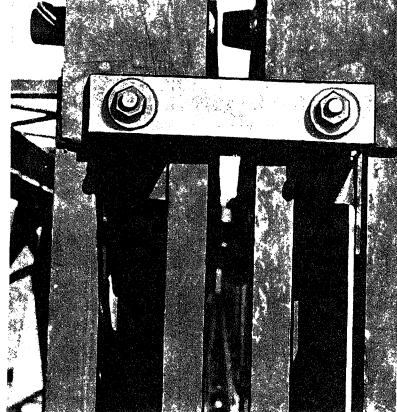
Tie plates between middle and outer trusses in triple-single bridge.
